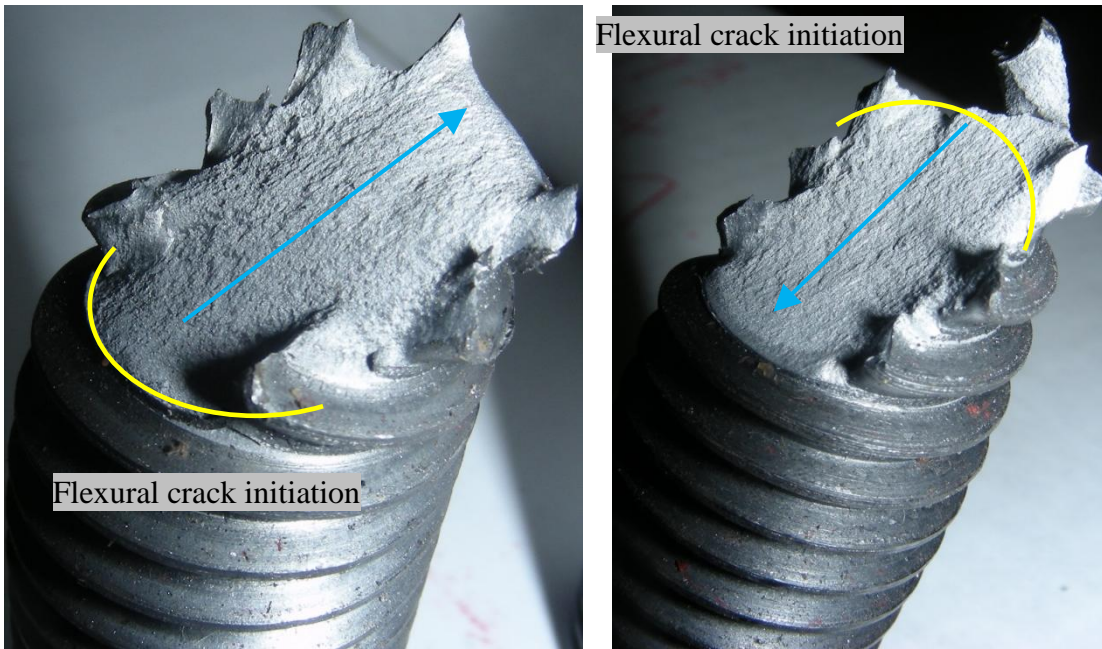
fracture surfaces of A307-4da-RL
